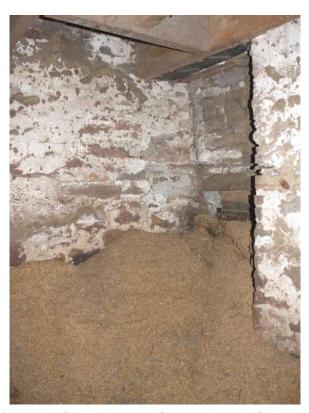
The mill, Room 0/2, detail of the west side of the north wall of the husk cupboard from the southeast
